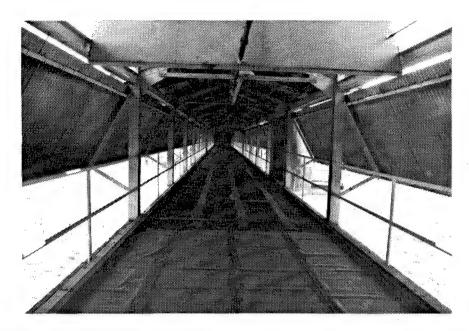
Building 221-2: Catwalk, or walkway, connecting the Blending Tower and Can Pack House.
